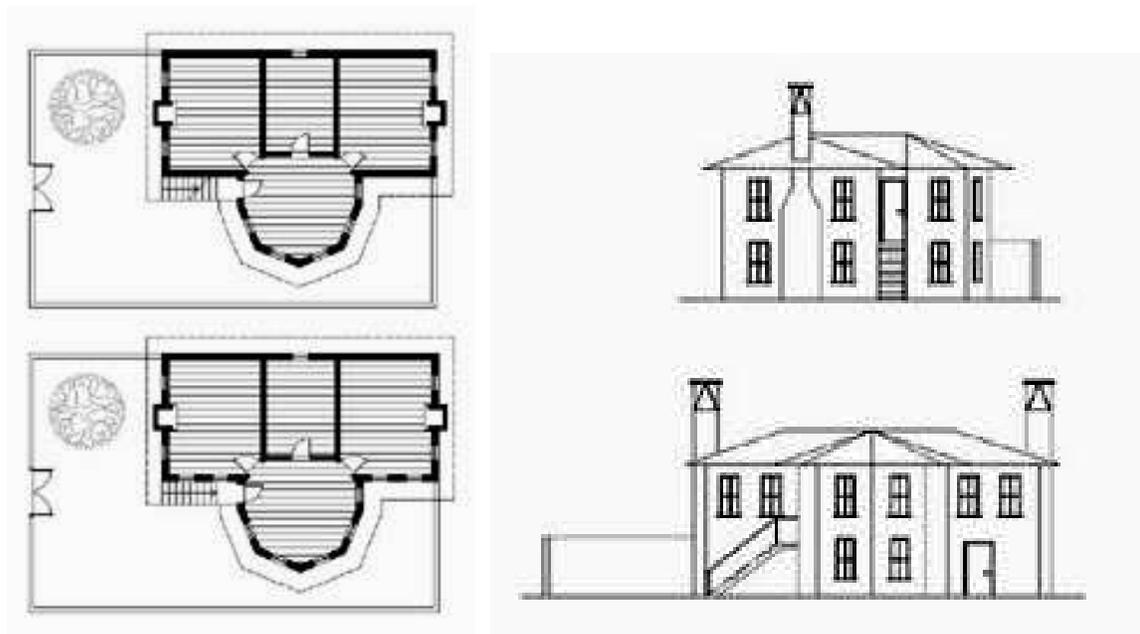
House Type 3b. Ground floor plan (upper left), first floor plan (lower left), side elevation (upper right), front elevation (lower right) (Drawings by author)
